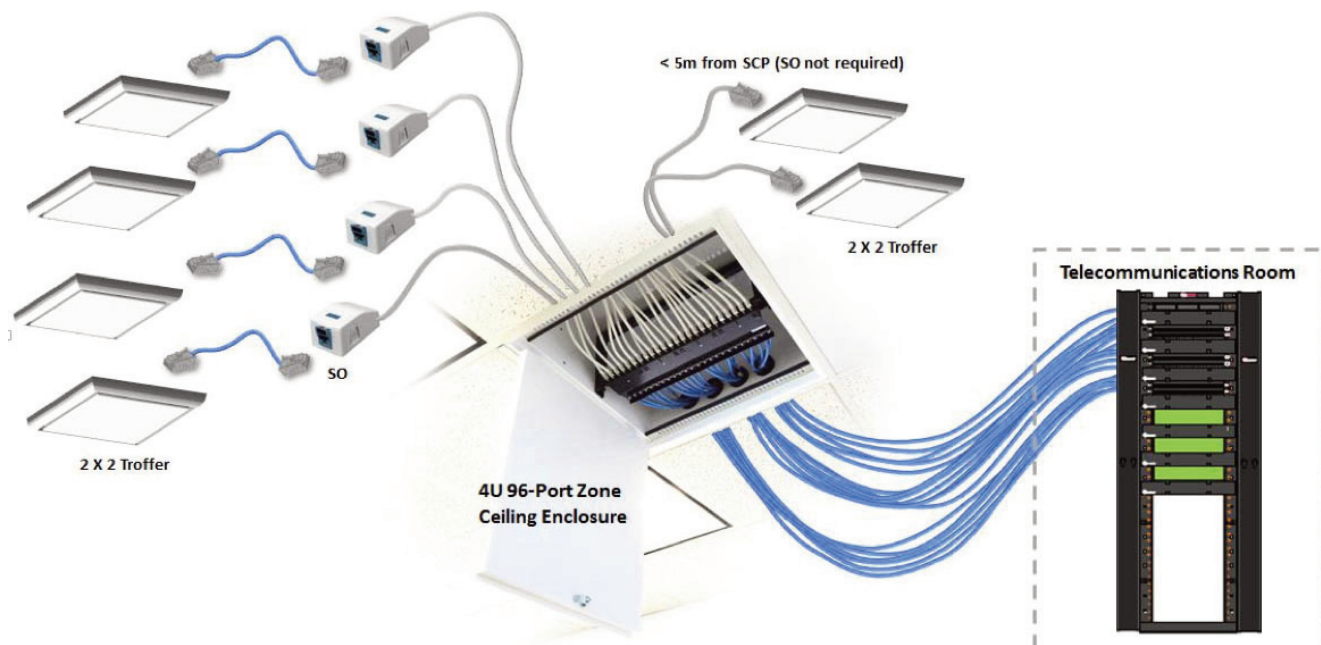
Example Zone Cabling for 2x2 Fixture Centric PoE Lighting Design
